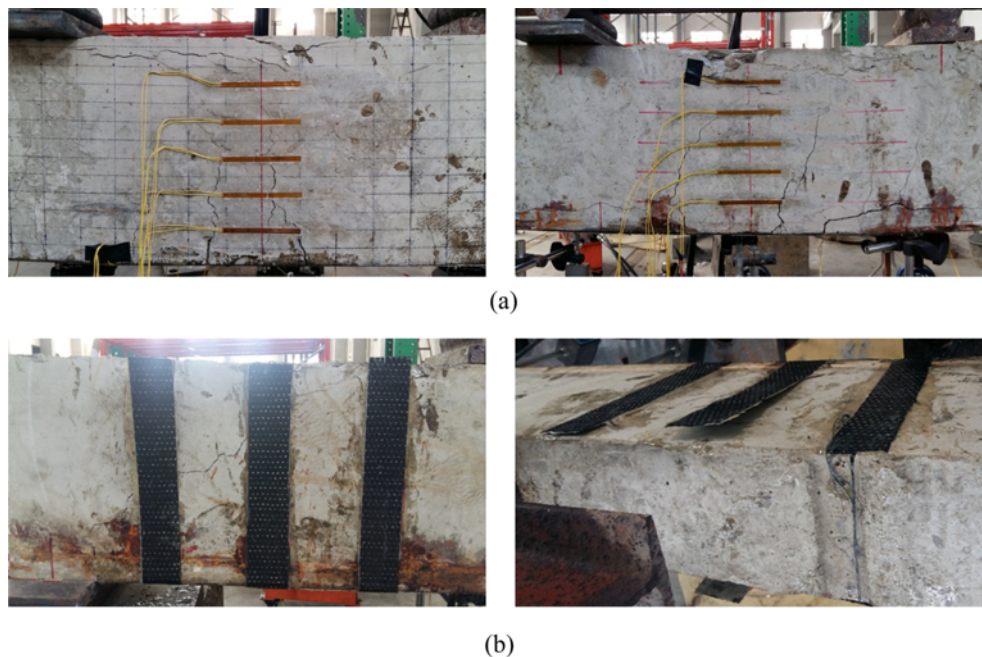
Photos of Different Failure Modes: (a) Concrete Crushing of Beam C6, (b) U-shape CFRP Peeling Away of Beam C18
